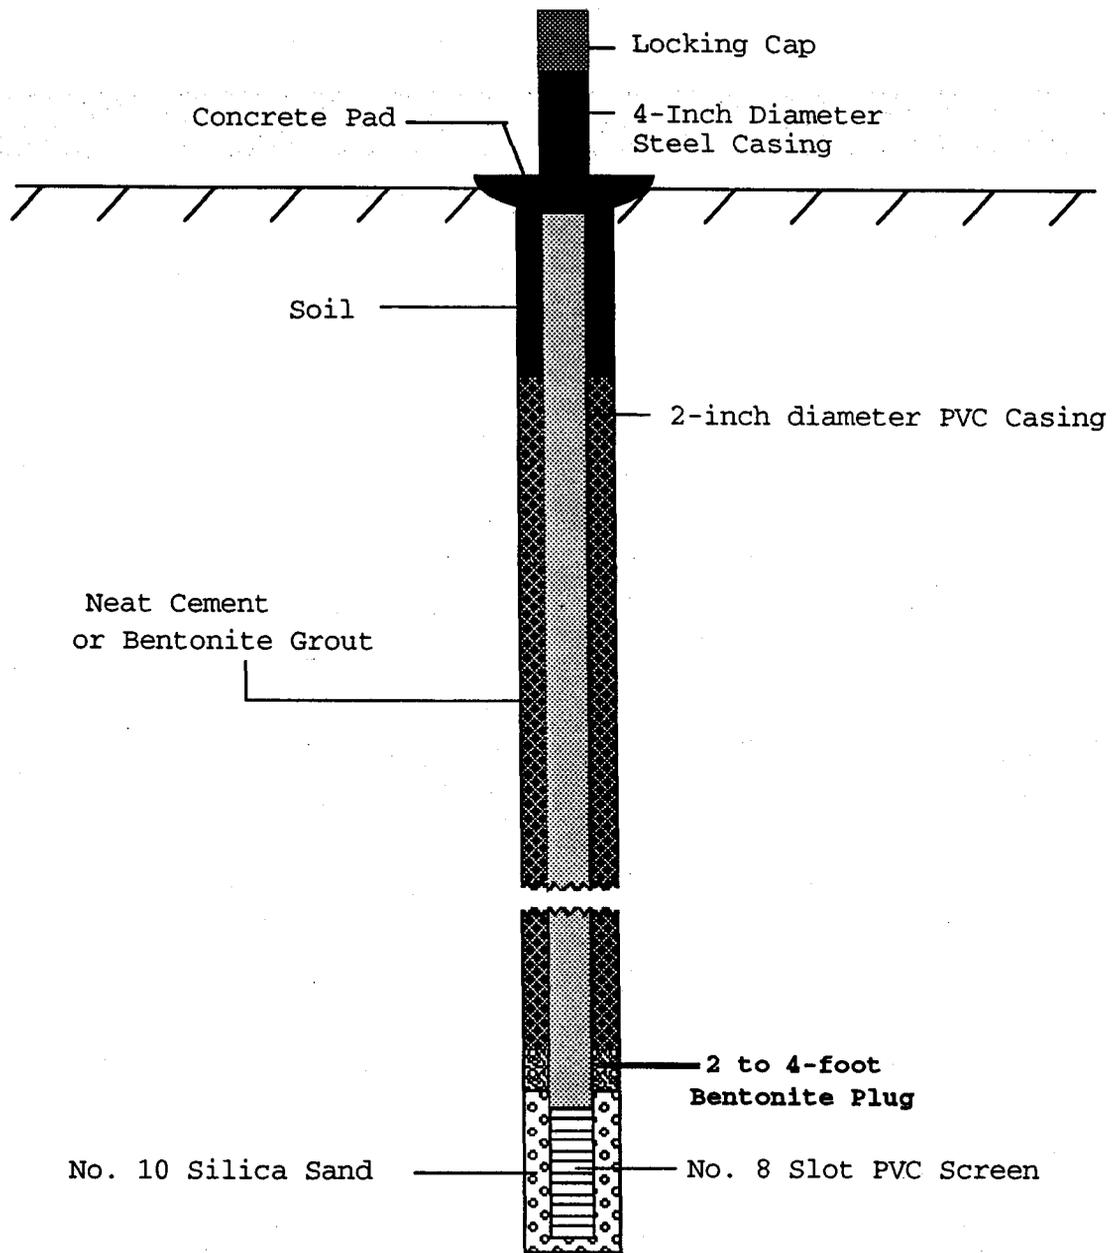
Construction design used for monitoring wells installed at the Fargo landfill.
